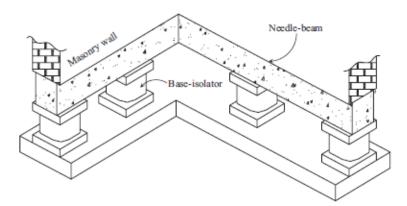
Load bearing masonry structure (Matsagar and Jangid, 2008)
